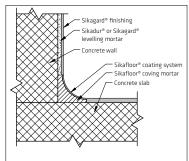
DETAILING AND JOINTING FOR FLOORING APPLICATIONS
